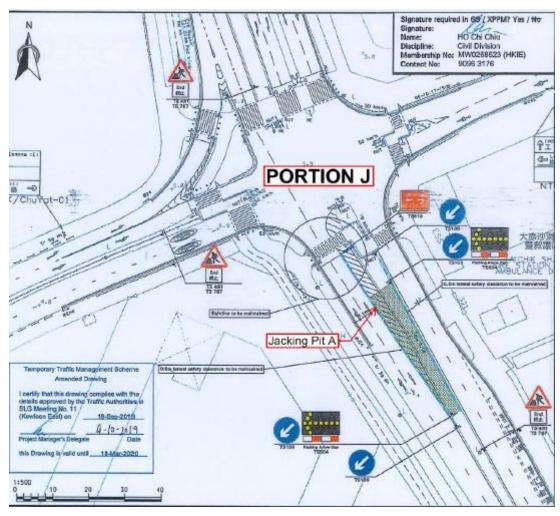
Location Plan for Portion J – CH. A13+50 to CH.A 14+00 (Pit A)
